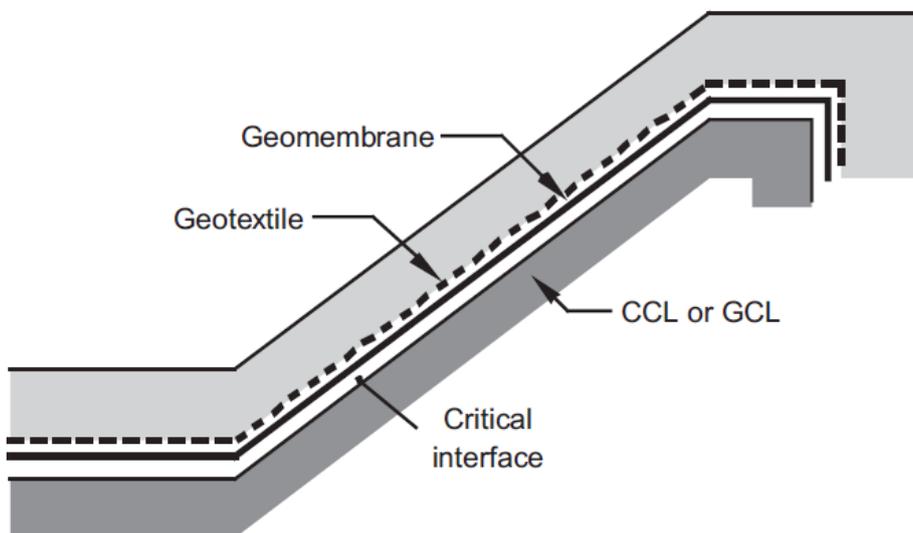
Veneer reinforcement with geotextile and geomembrane on GCL or CCL (Koerner and Soong, 2005)
